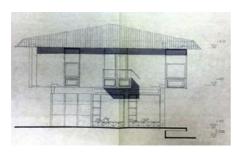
Sabiha Barlı Pension, south elevation, 1972; Düren House Renovation, Etiler;
